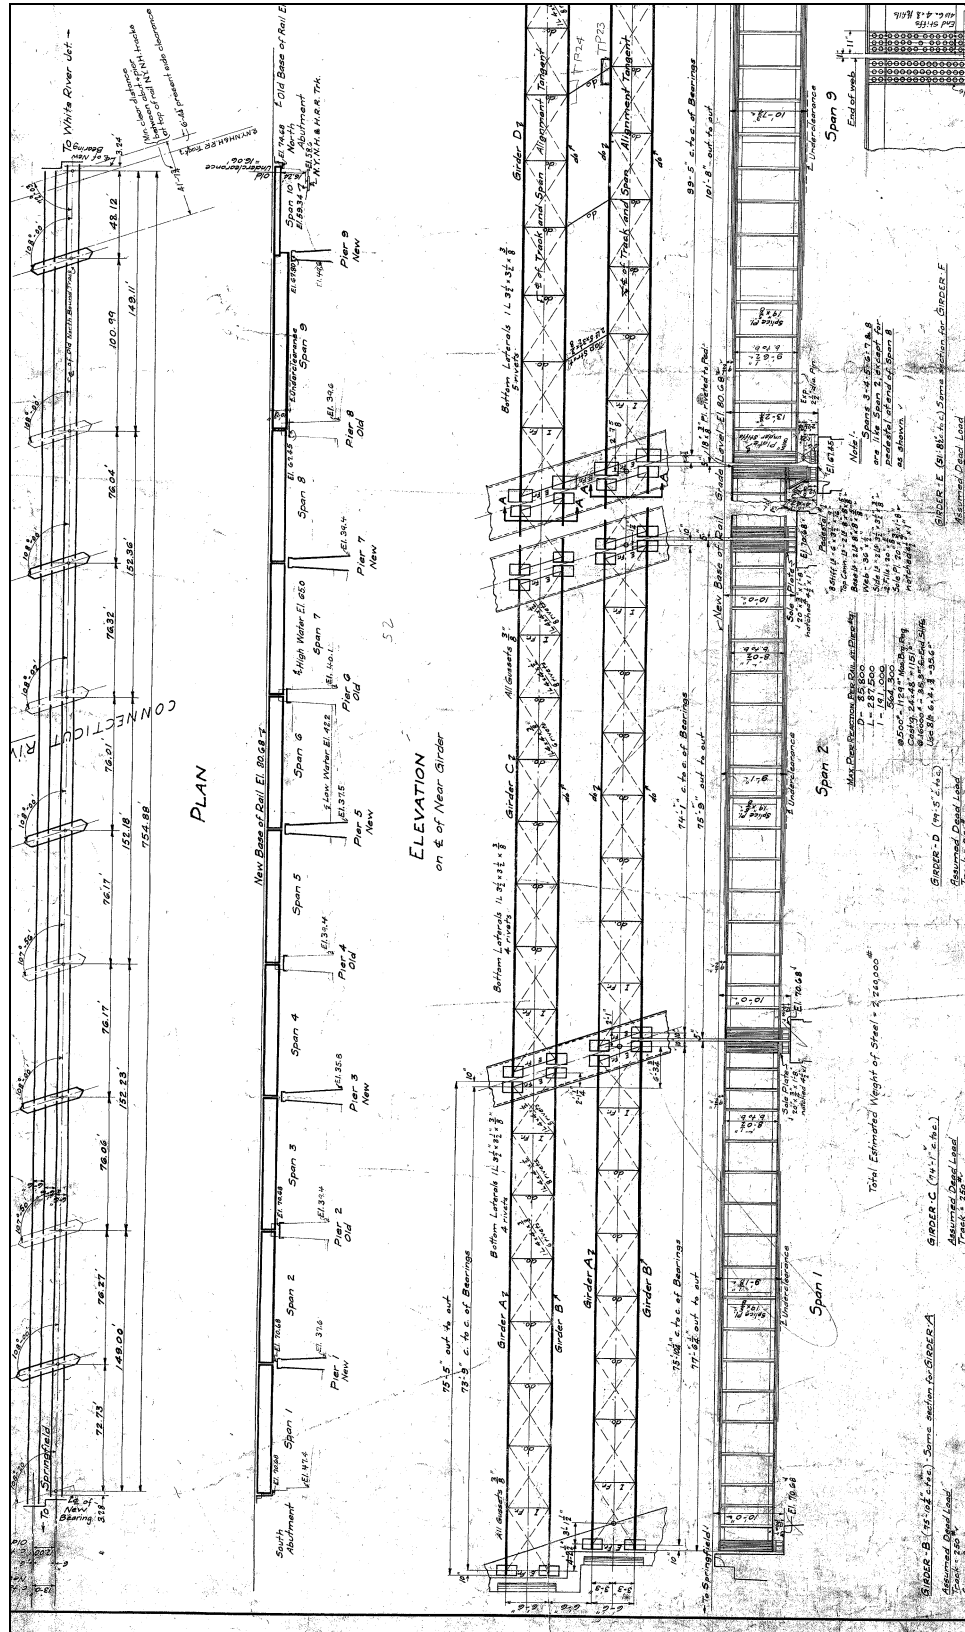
Portion of original plan sheet showing overall plan and elevation of bridge (source: Massachusetts Bay Transportation Authority files).
